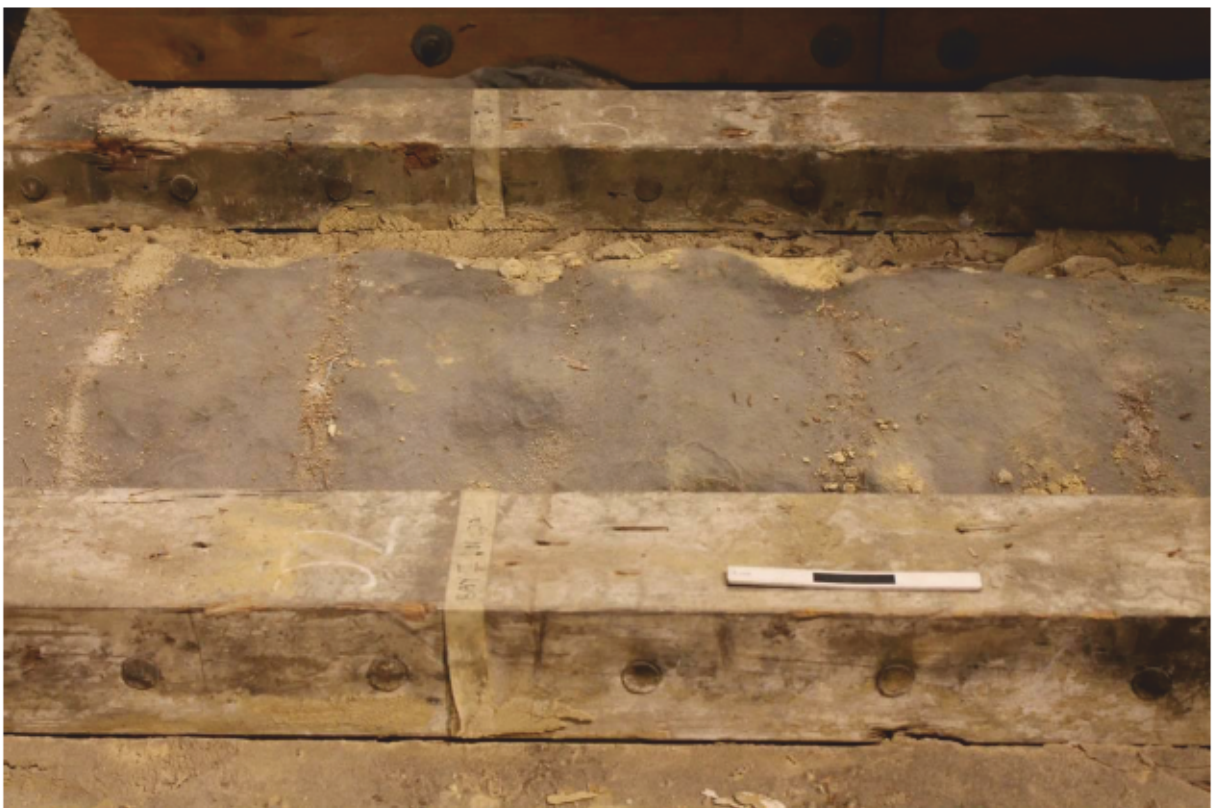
Bay III Joist 2 detail of re-use (0.15m scale)
